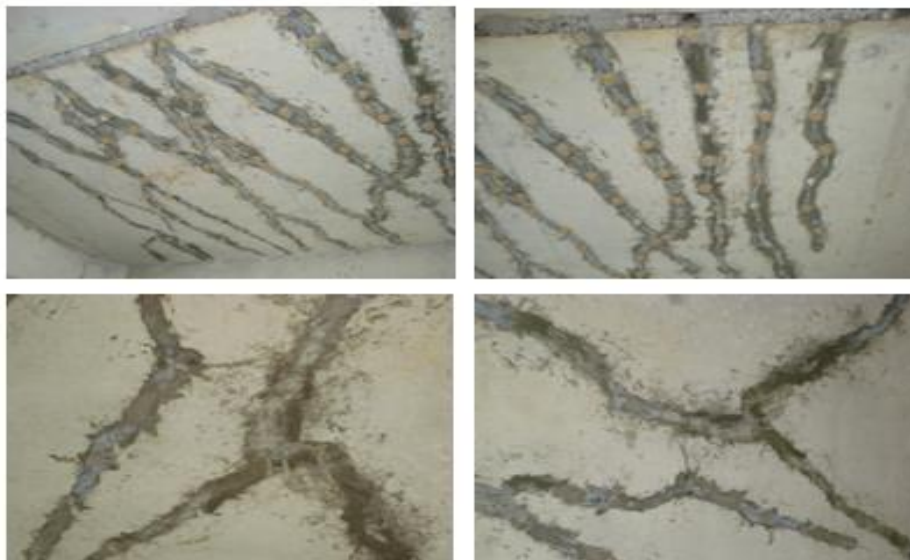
The Crack that Occurs at the Bottom Part of a Two-way Half Slab Precast
